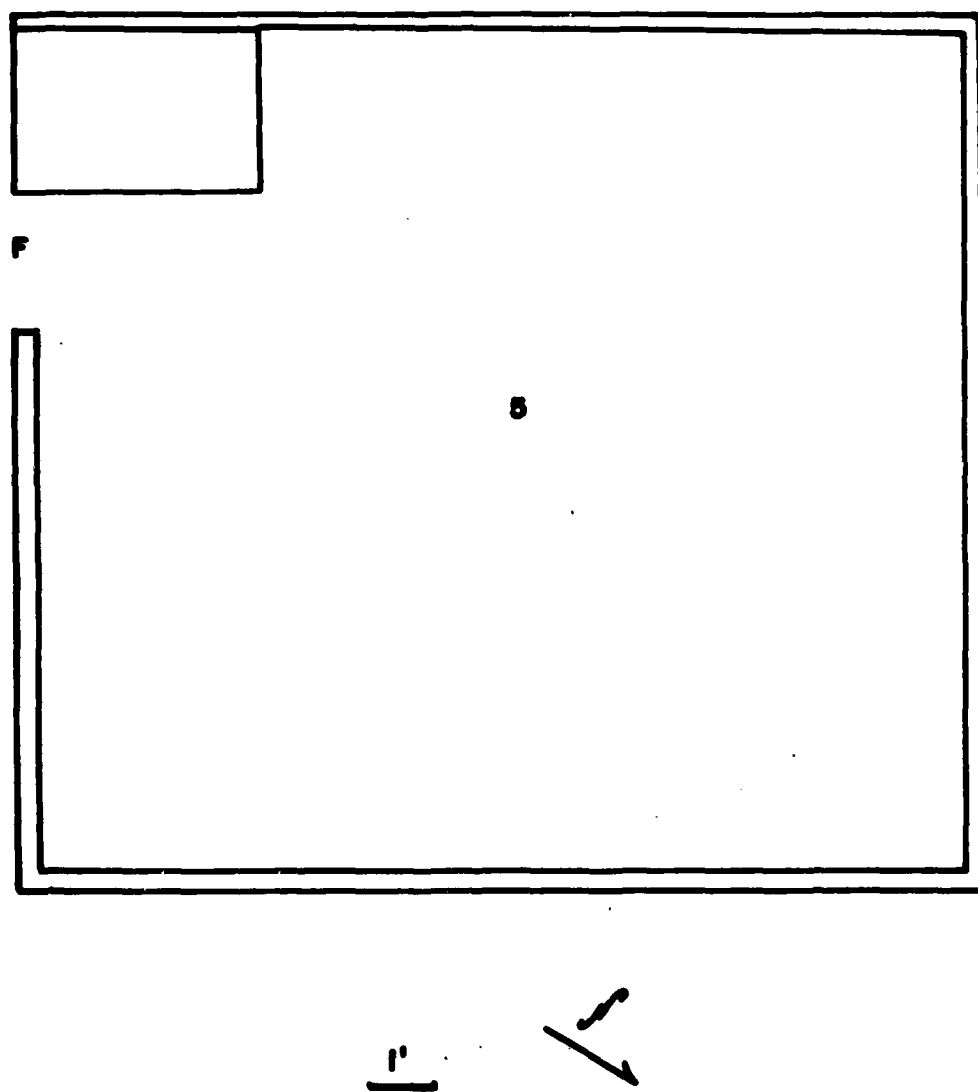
Loft floor plan in log portion of the J. C. Jenkins dwelling.
